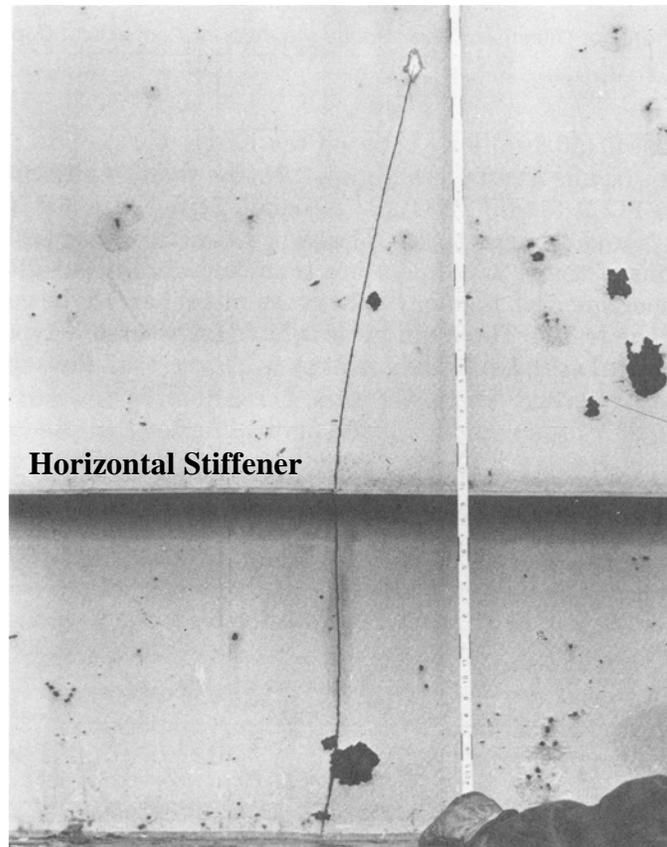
Crack in girder web of Quinnipiac River Bridge (Adapted from Fisher 1984)
